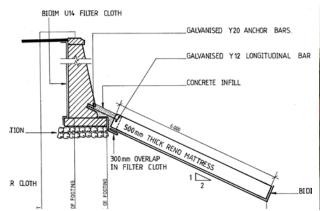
1989 Section showing revetment works. Source: WLS Engineers Drawing 6565
